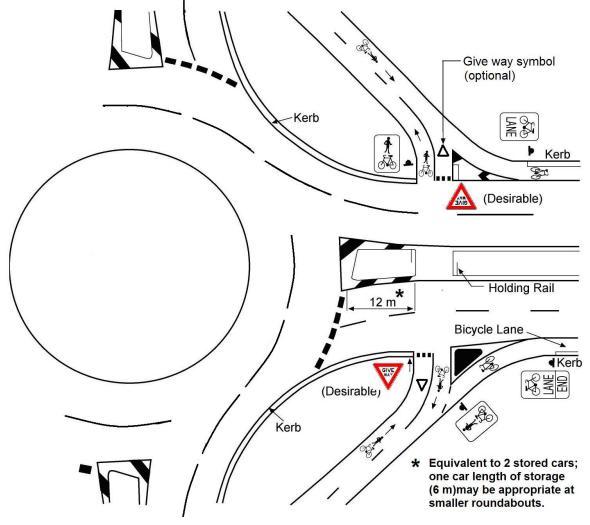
Crossing detail for a shared path adjacent to a multilane roundabout
